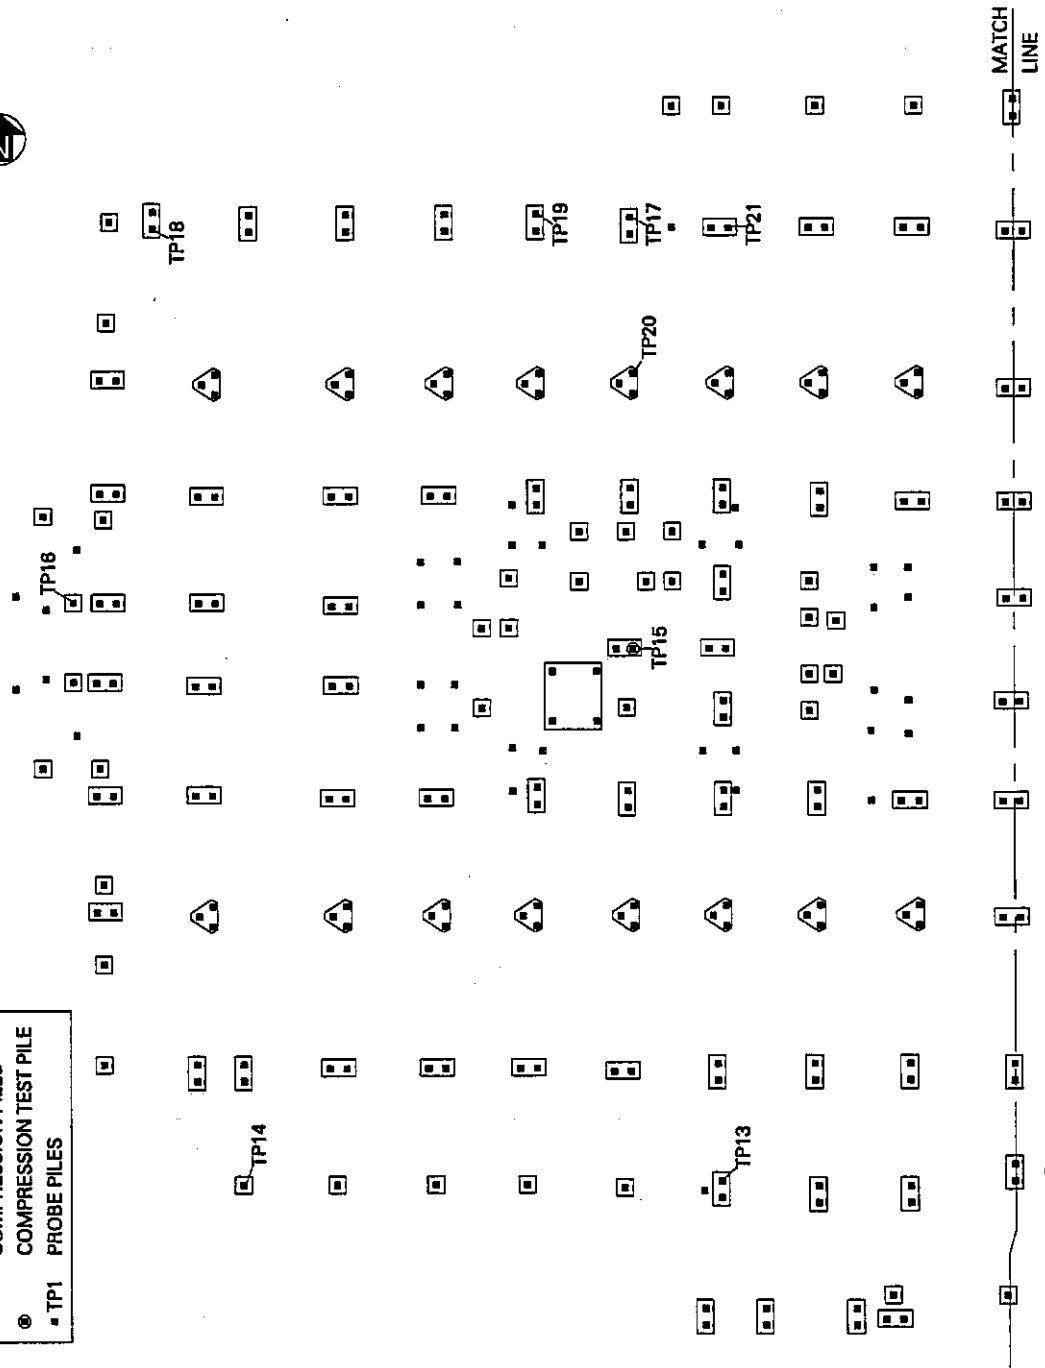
Pile Layout Plan and Loading Test Locations, Parkade Area
